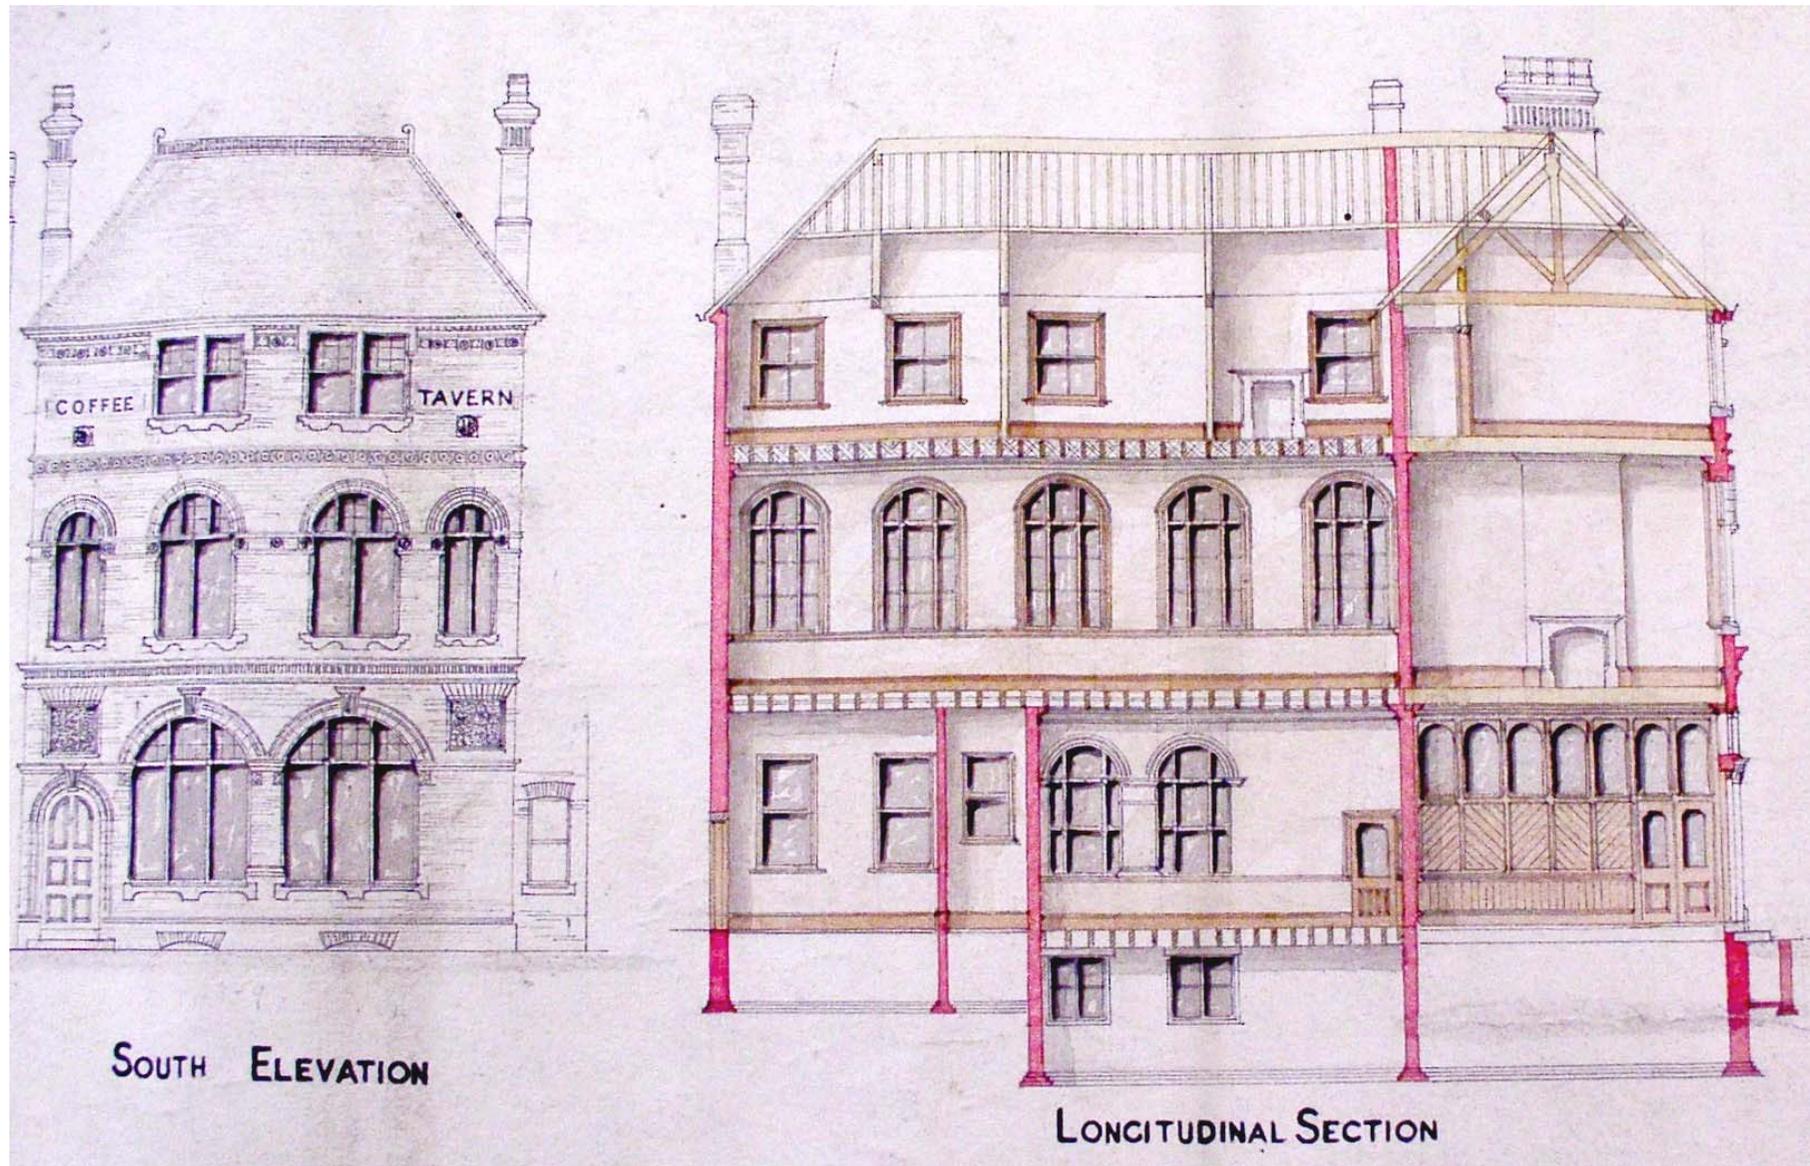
16 Old Square (former Coffee Tavern) - architect's drawings, c.1880, elevation and section (WRO CR 592 Box 10)
